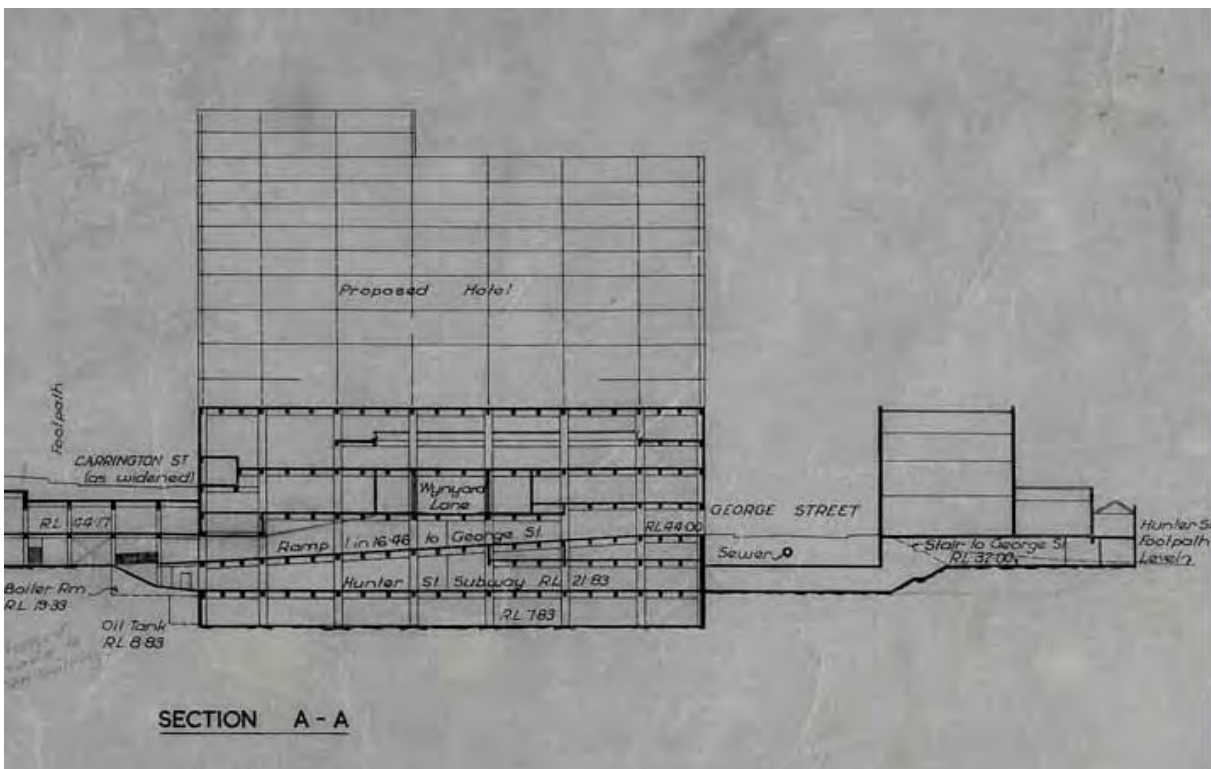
Part of the 1932 plan of the proposed Plaza Hotel to be built across the site from Carrington to George Streets with the railway subway infrastructure constructed underneath. This plan shows the general arrangement of Wynyard Station pedestrian subways to George and Hunter Streets. The lowest level is the hotel basement, followed by the Hunter Street Subway, and then the ramp to George Street. The location of Wynyard Lane is also shown. Only the basement of this hotel was ever constructed. (Source: State Records R121 10.C.123)
